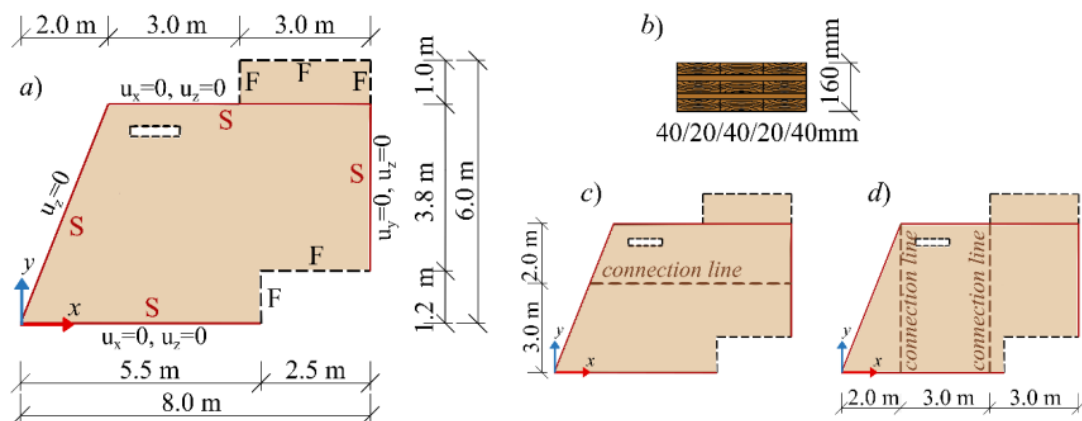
Complex-shape CLT floor structure (a) floor layout with boundary conditions, (b) floor cross-section, (c) floor configuration with panels oriented in x and (d) y direction [21]
